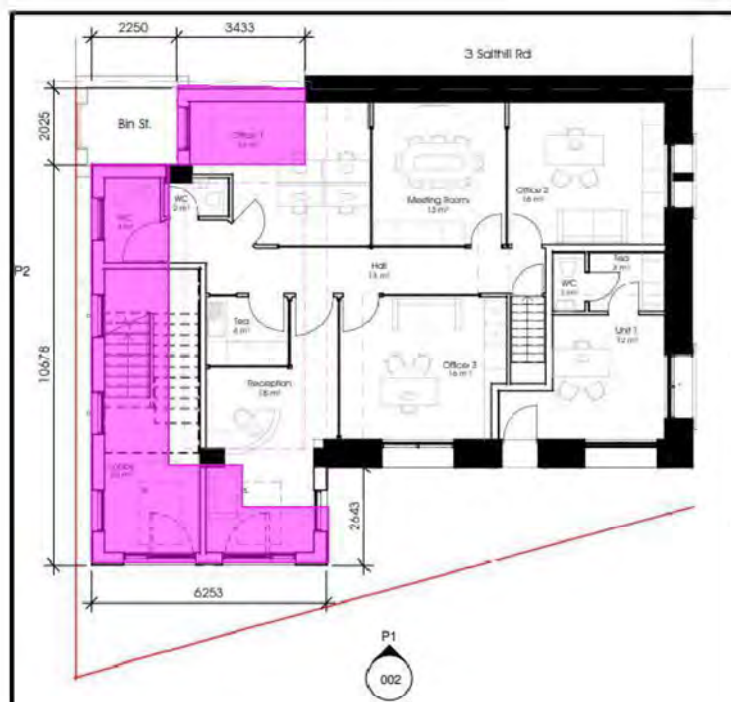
Proposed Ground Floor Plan (extension highlighted)
